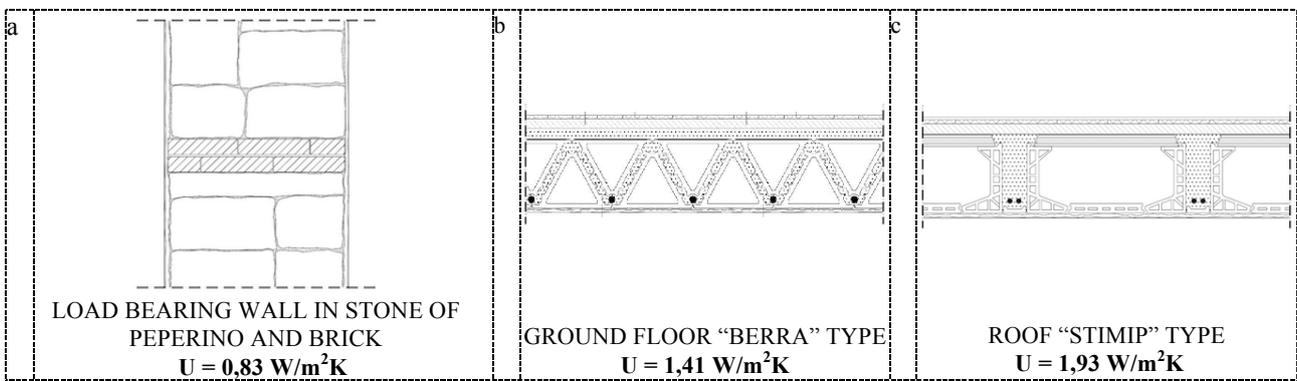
Abacus of constructive elements (a) load bearing wall in stone of peperino and bricks; (b) ground floor BERRA type; (c) roof SIMIP type.
